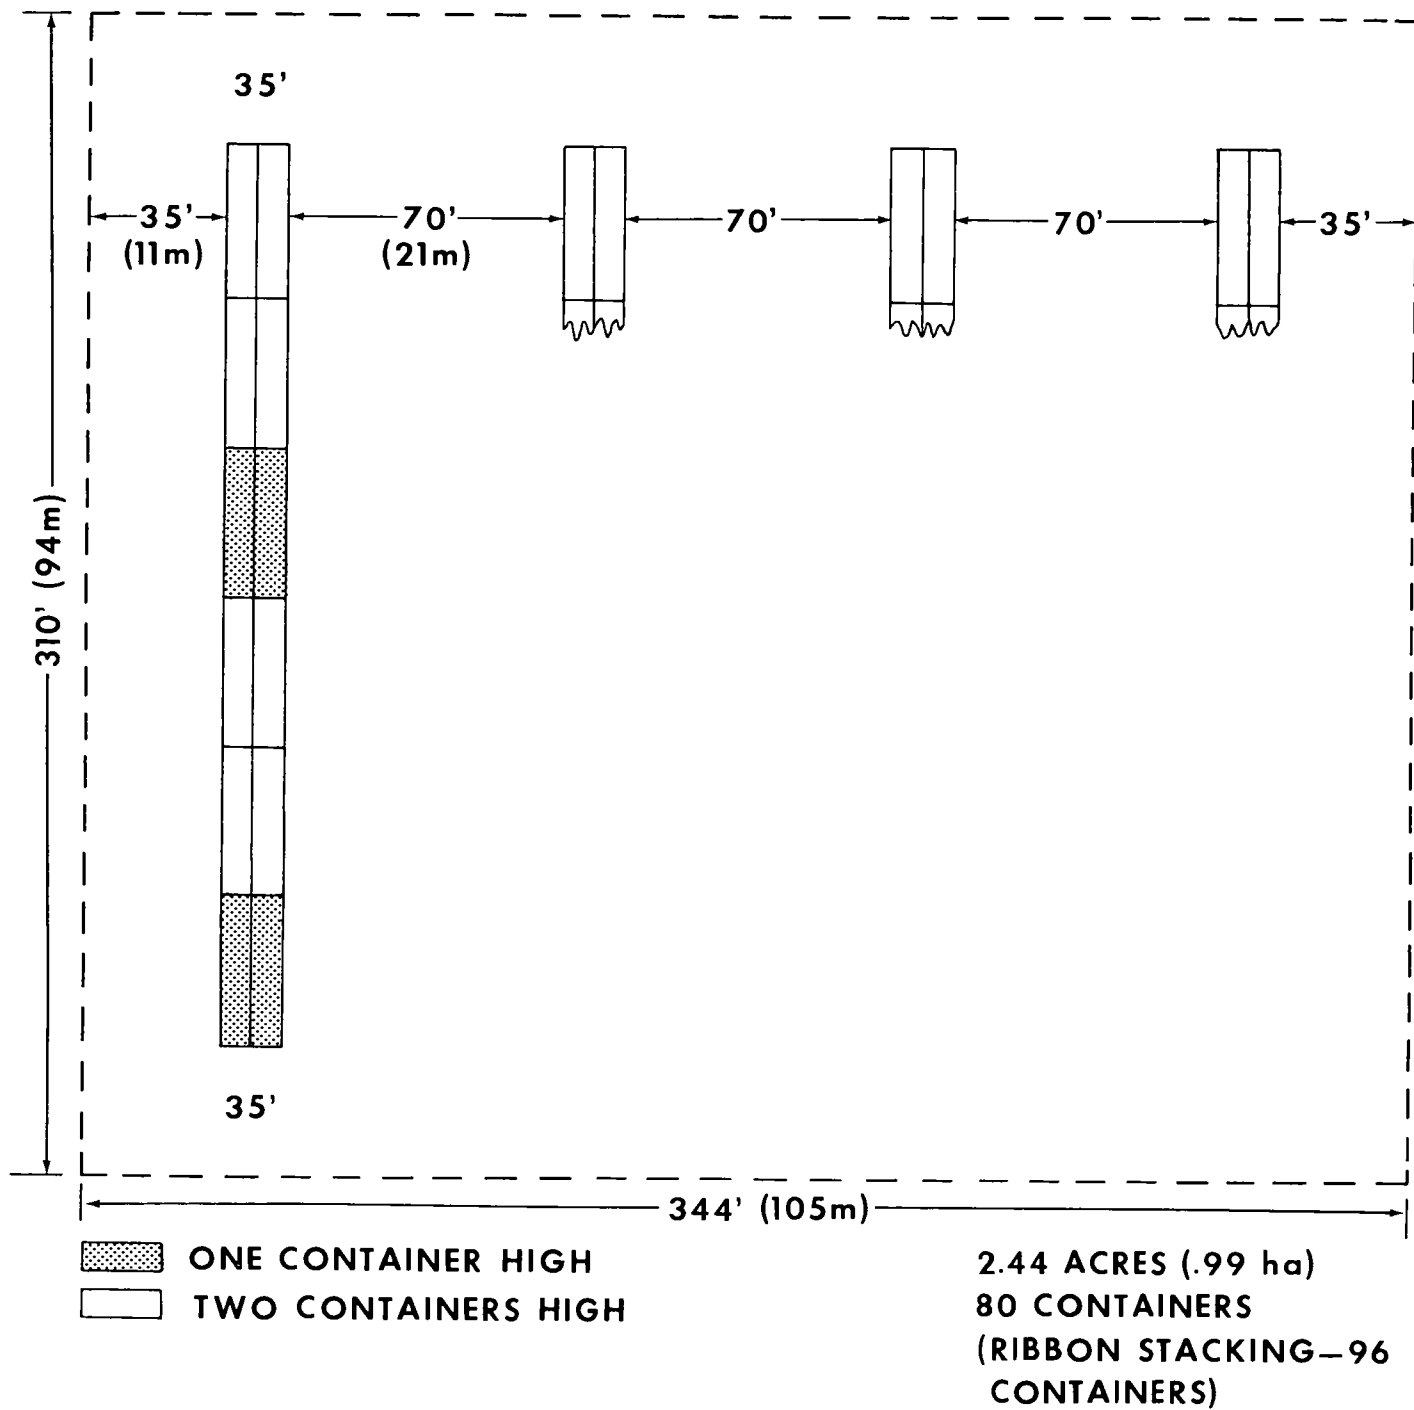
Cluster plan for frontloader turret stacking of 40-foot containers—70-foot aisles.
